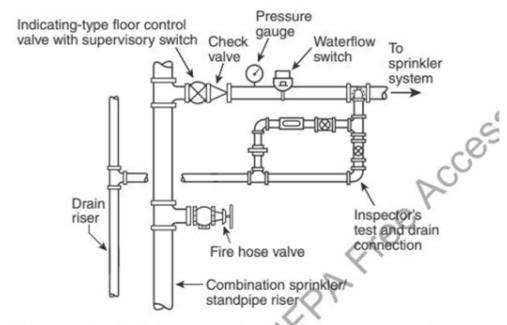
(a) Acceptable Piping Arrangement for Combined Sprinkler/Standpipe System.
